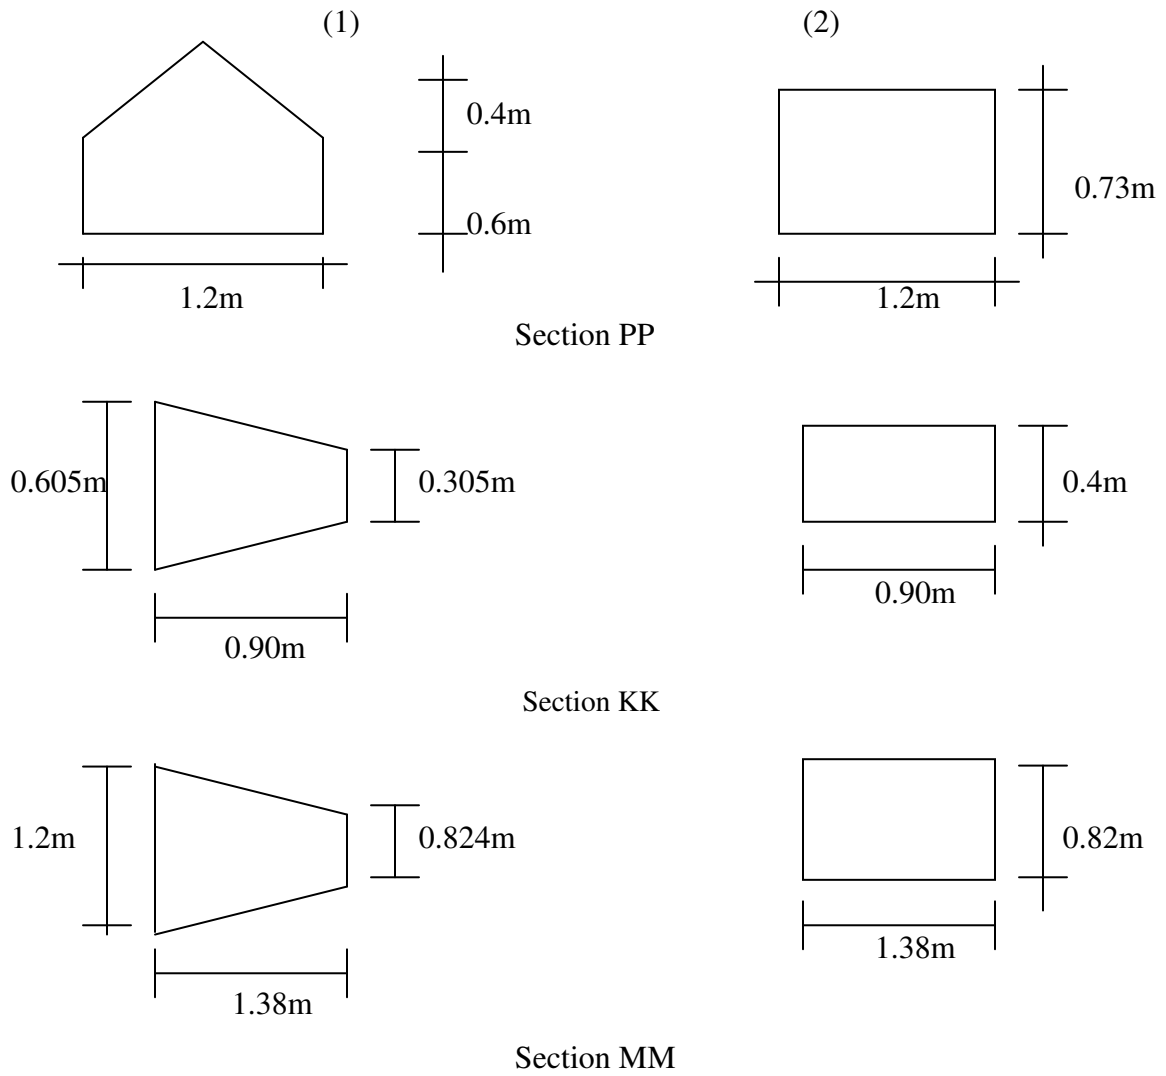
Geometric dimensions at sections PP, KK and MM 1) actual dimensions 2) modified dimension
